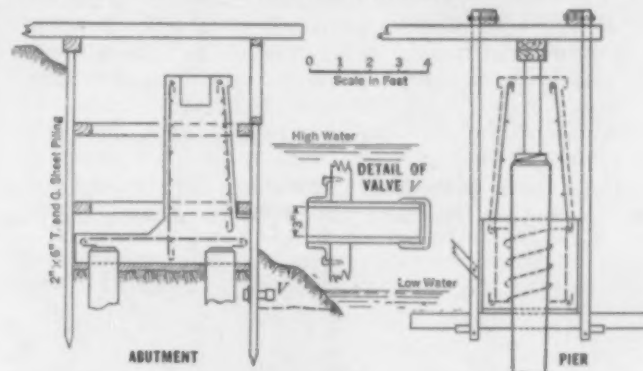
DETAILS OF ABUTMENT AND PIER FORMS
